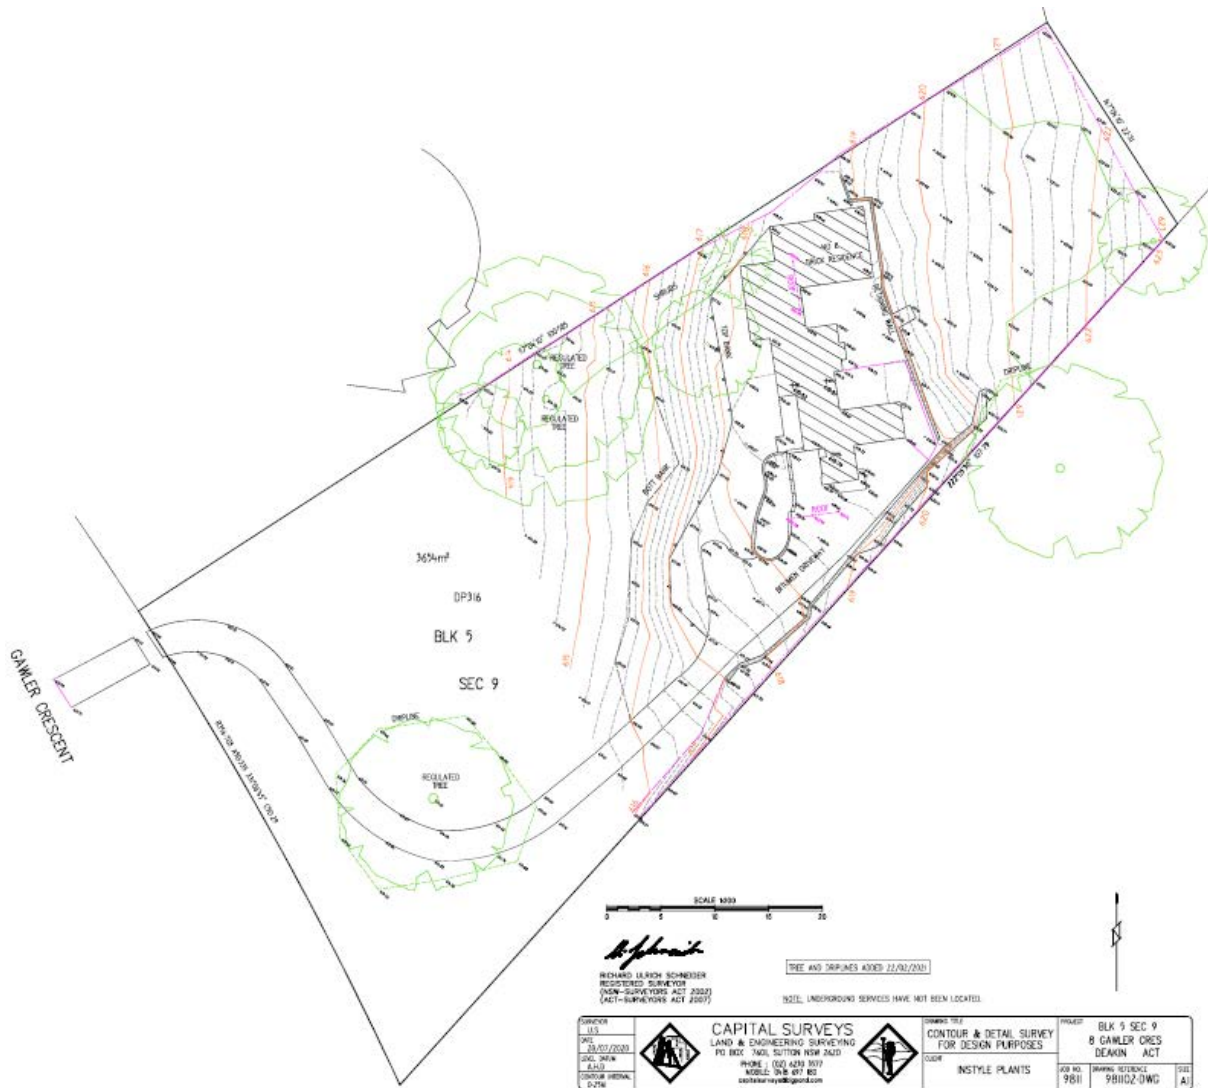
Contour and detail plan of Block 5 by Capital Surveys (2020).
